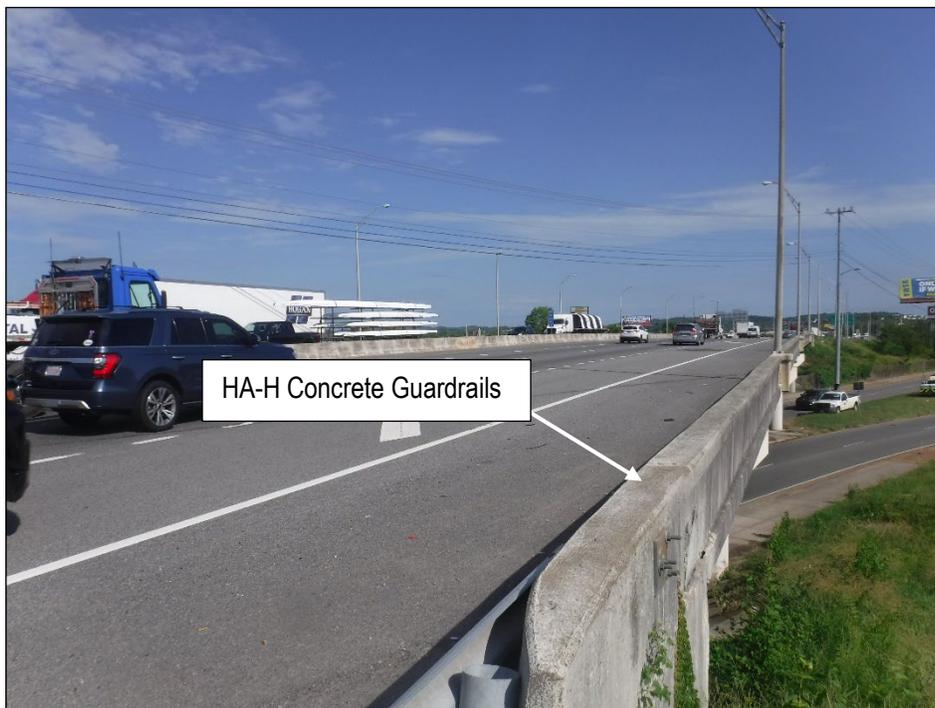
View of HA-H on the I-24 bridge over North 1st Street.
